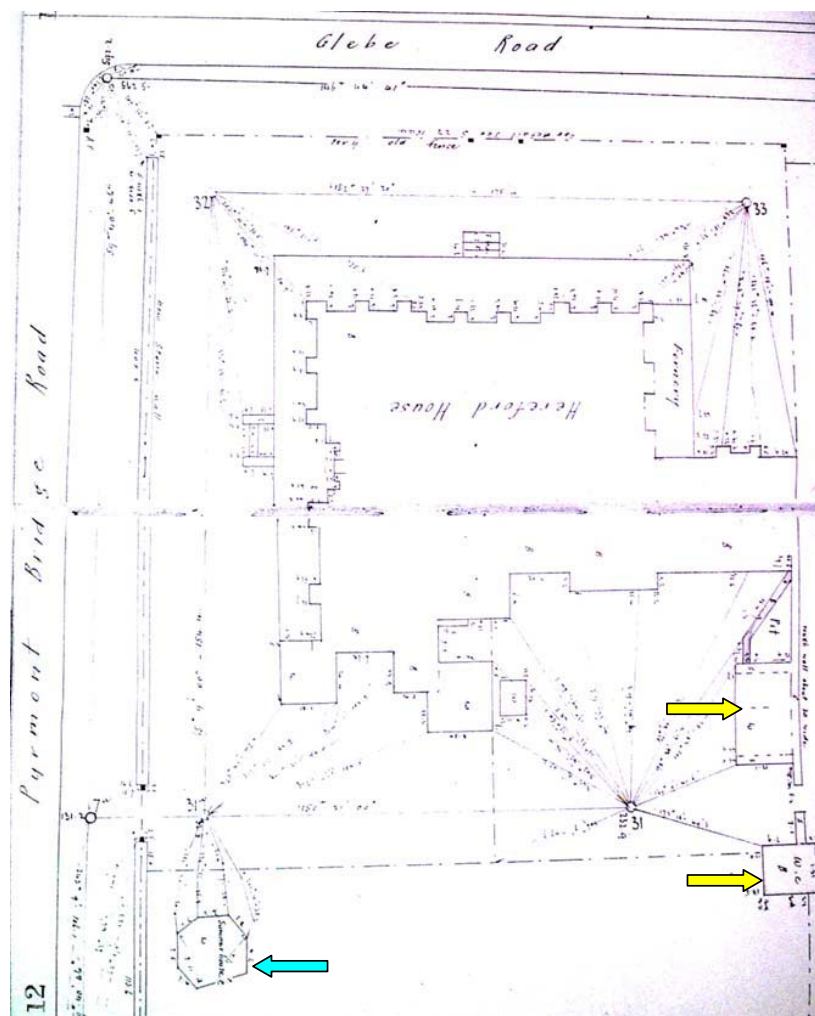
Surveyor Shute's field book plan of *Hereford House* in 1888. Note the summer house arrowed blue and the toilet outbuildings arrowed yellow. There was also a pond located off the southern façade of the villa, this recorded in State Archives documentation. The wall along Pymont Bridge Road is marked 'new stone wall'. This plan was prepared prior to the southern extension to the villa. Note that the plan of the house was not drawn to its true distance from the adjoining roadways.
